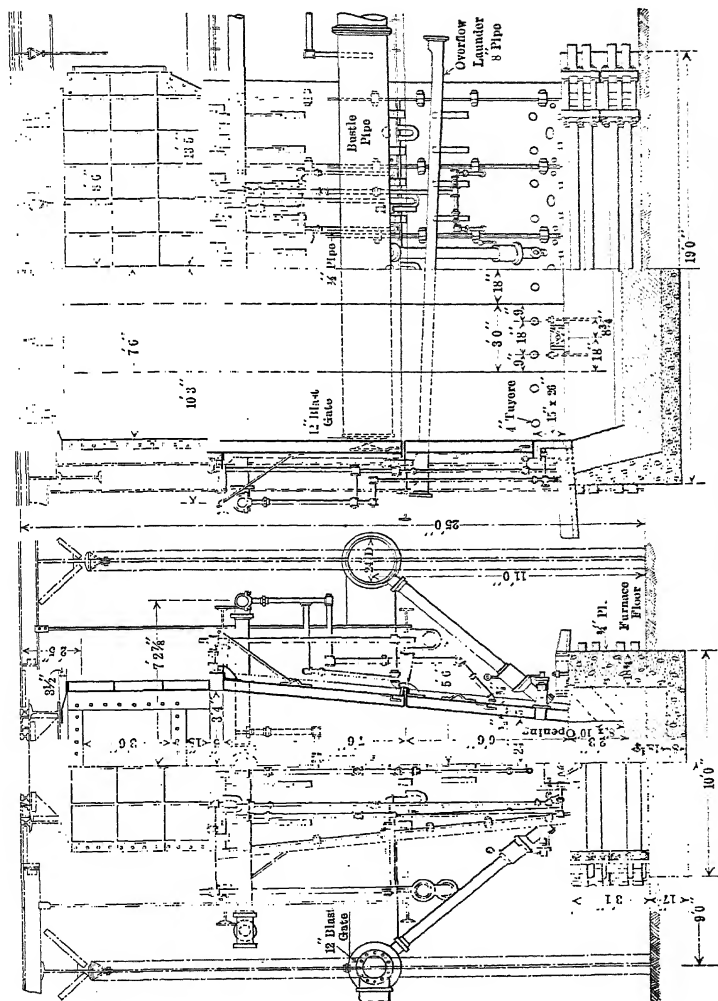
and 183.—Blast furnace, Northport Smelting and Refining Co., Northport, Wash.; elevations.
